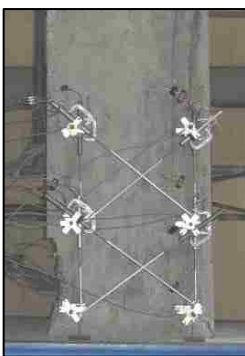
(F4) Concrete Spalling on Flexural and Side Faces
